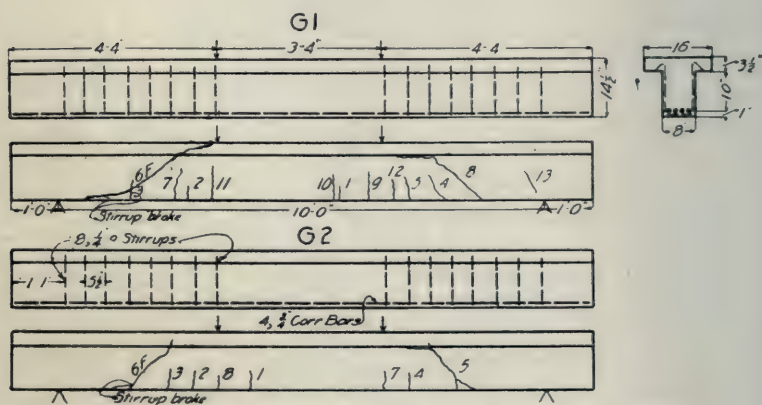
Beams of Series F— Reinforcement and Cracks.
